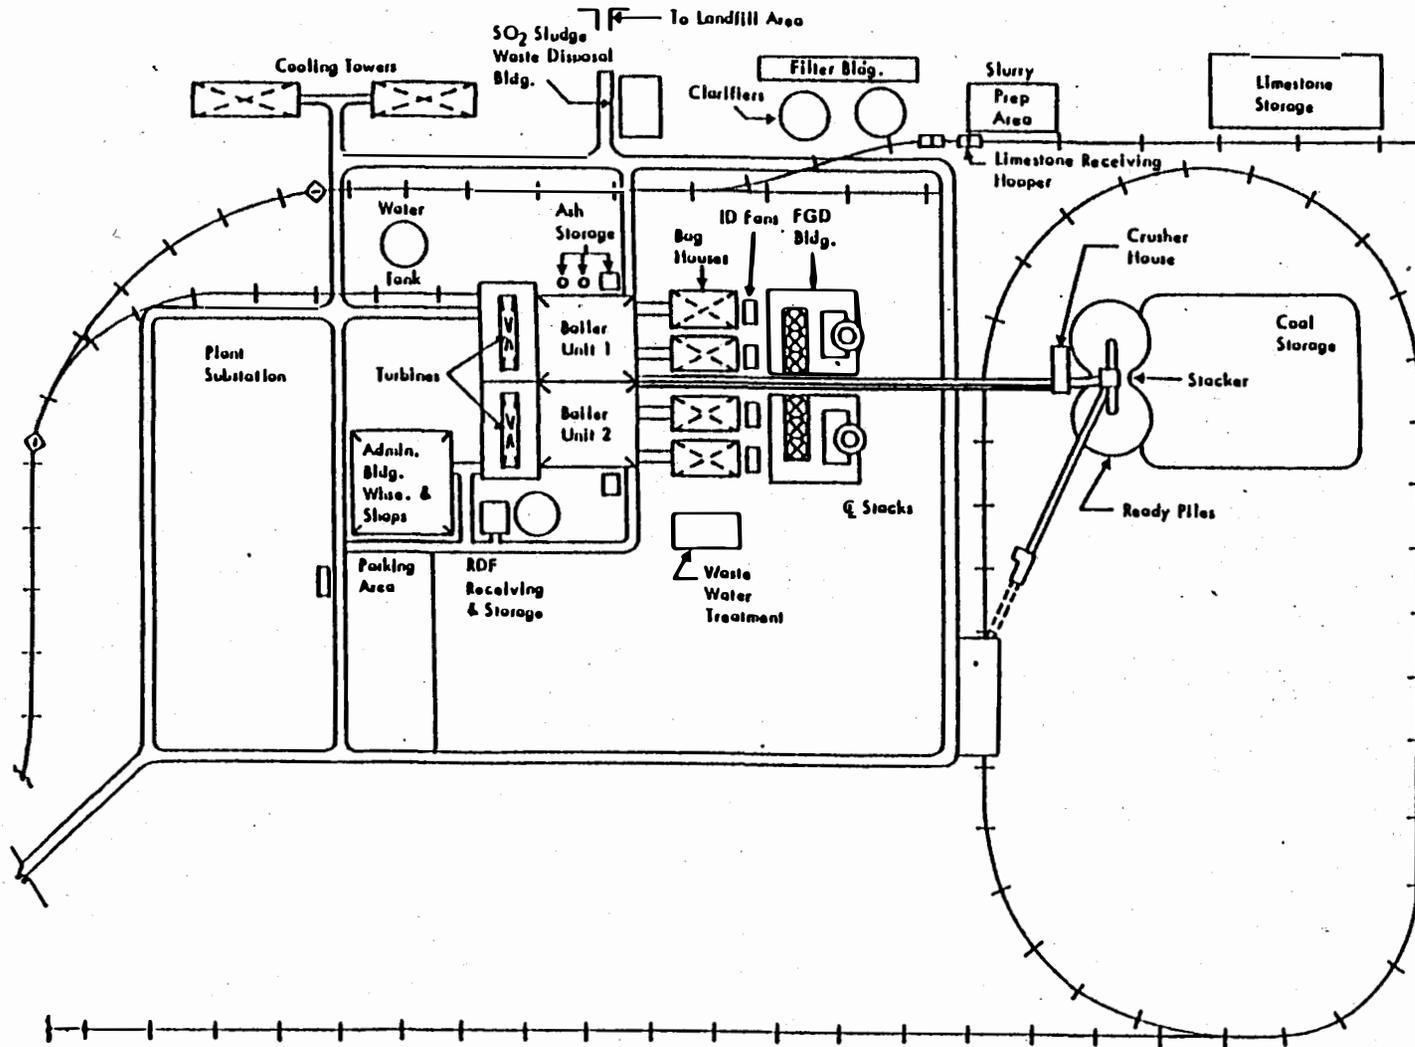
Plan for Conventional Coal-Fired Power Plant Site (806)
